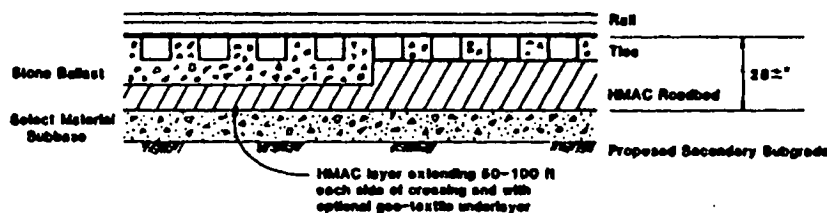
Cross section crossing surface following hot-mix asphalt application.
